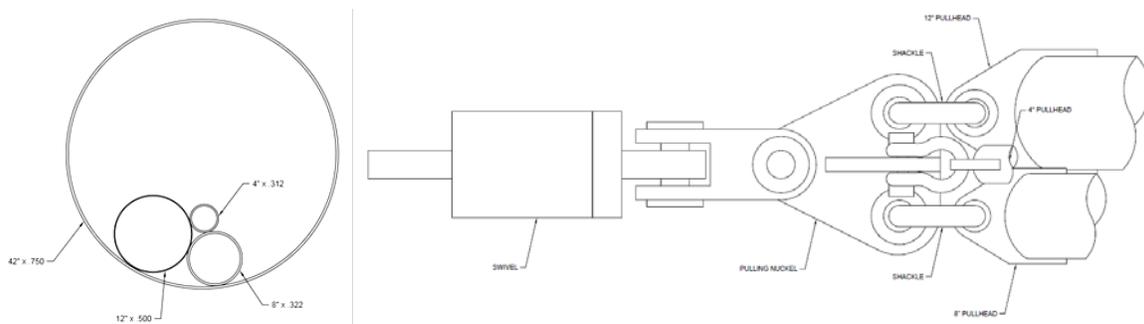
(a) Conduit Bundle Cross Section and (b) Pulling Assembly
